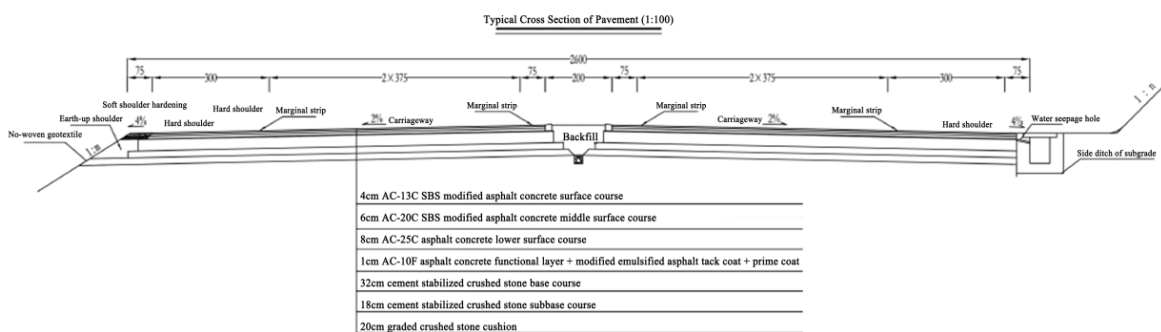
Cross-section of Pavement Structure of Mainline of the Project
